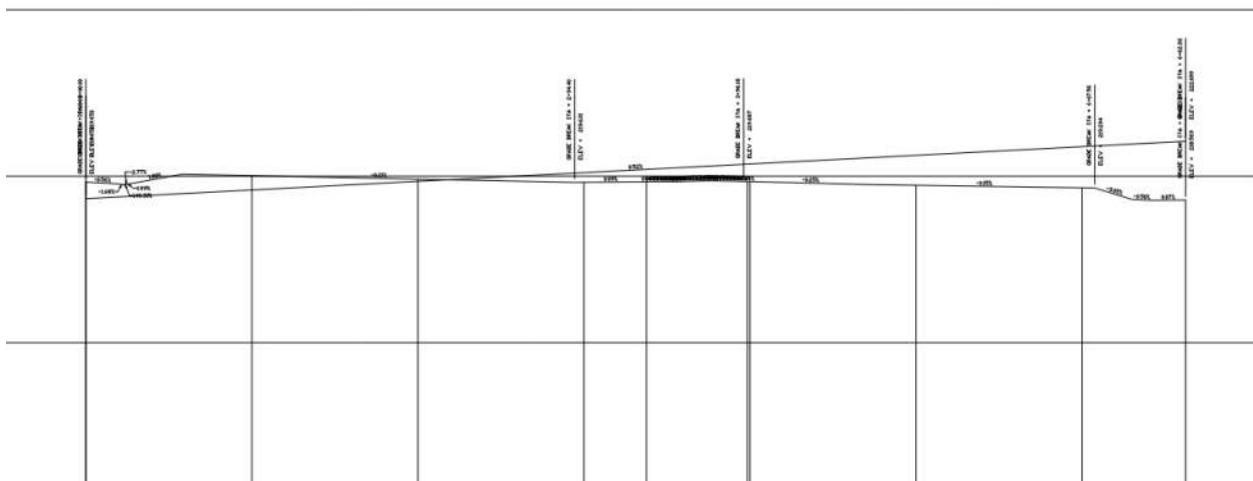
Duran Road with 0.53% constant slope vertical alignment.
